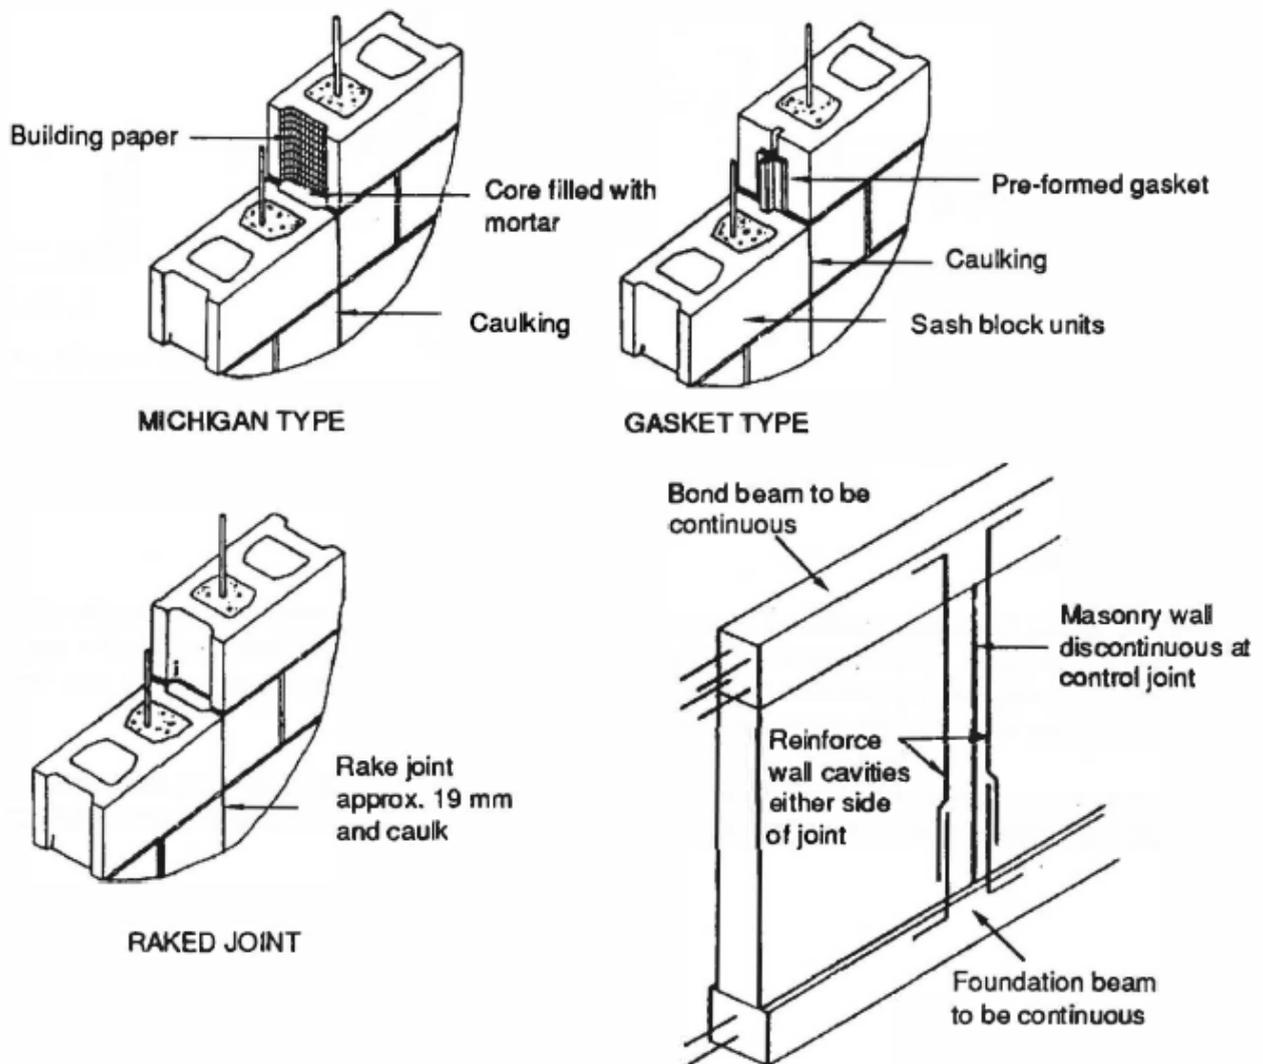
A: SOME METHODS OF PROVIDING SHRINKAGE CONTROL JOINTS
